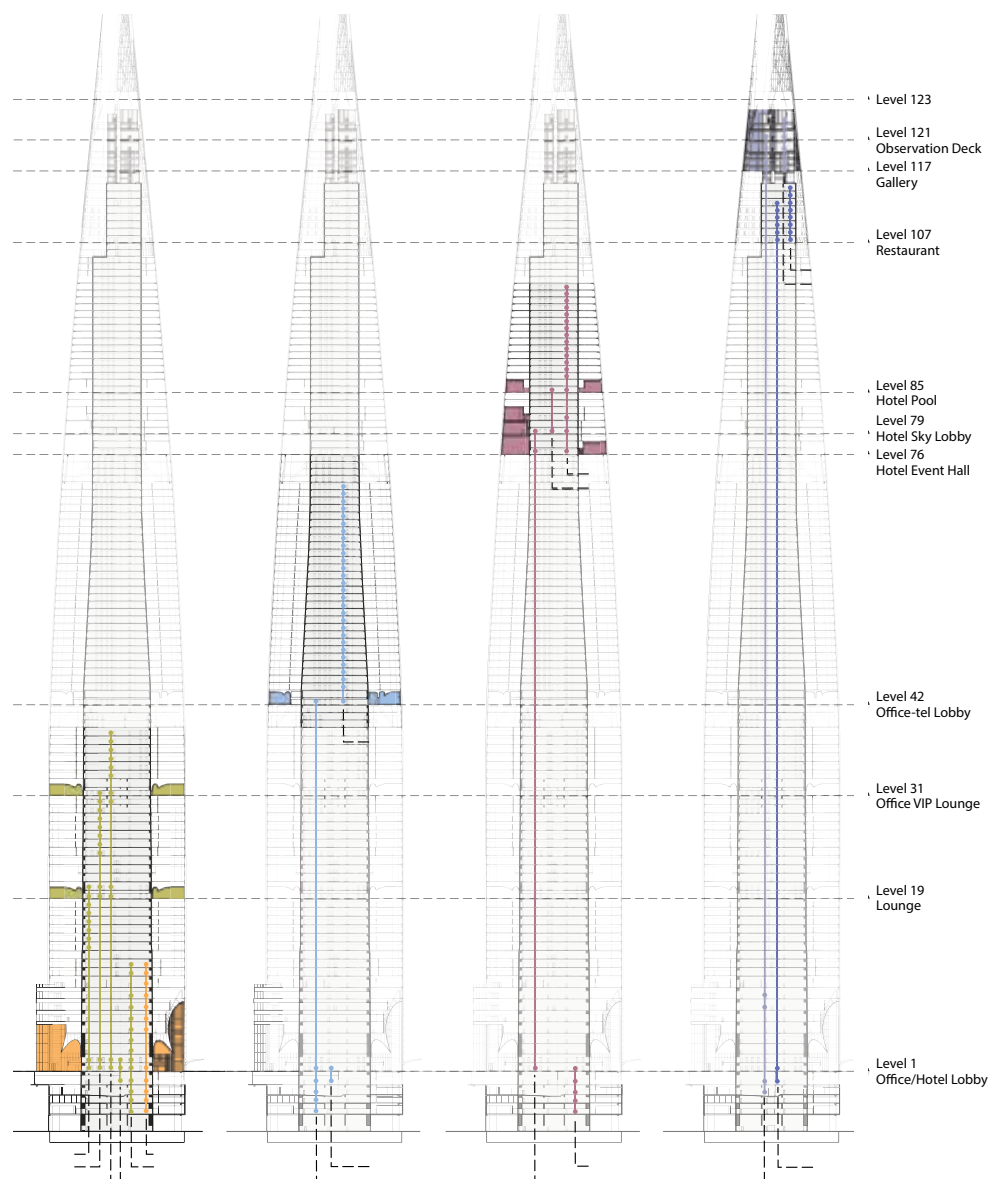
Stacking diagram showing the four elevator zones in the tower. From left to right, office zone; office-tel zone; hotel zone; observation/restaurant zone.
